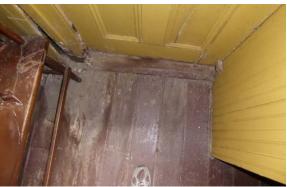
Staining and rotted wood at floorboards and exterior door frame. Cracked wood door panel.
